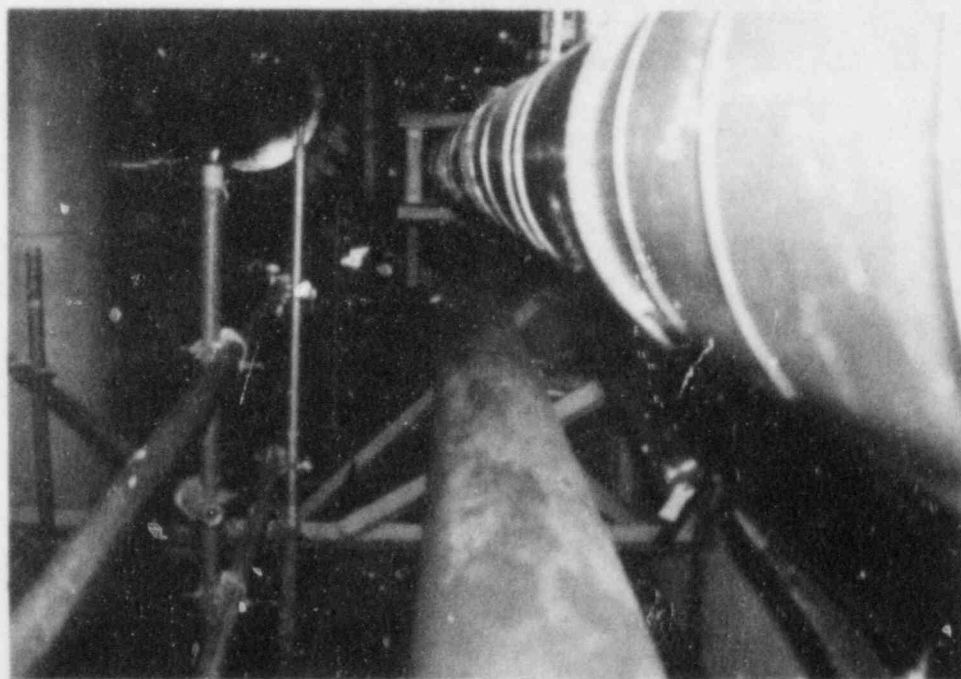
Outward (or Lateral) Set in FW Line "B" Looking West Toward Support HOOL
